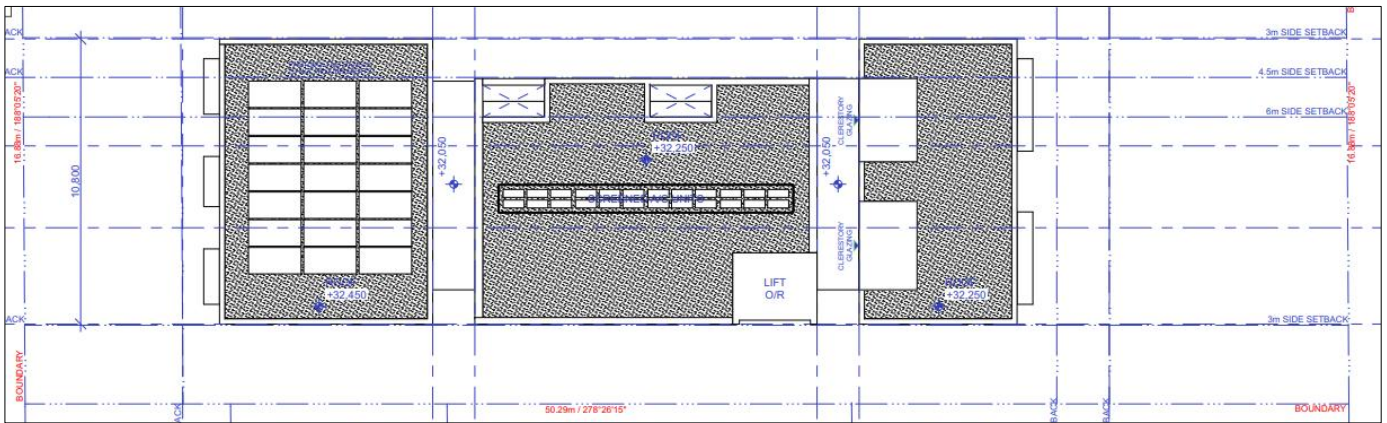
(above) Amended Roof Plan submitted by the applicant. Source: Benson McCormack (2026).
